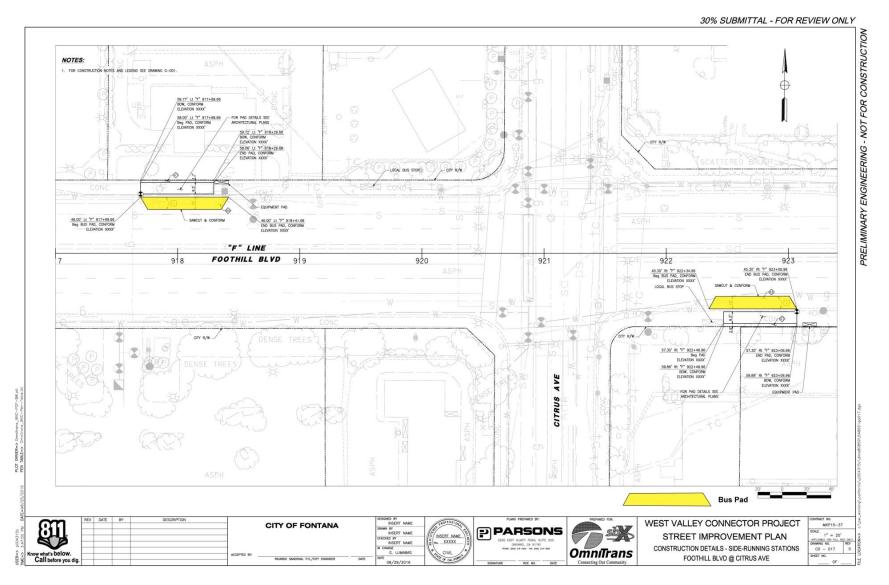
Typical Bus Pad Locations for Side-Running Stations along Route 66
